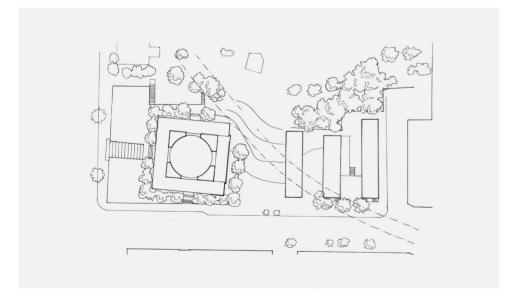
Site Plan with spilling Observatory Hill, Existing, 1:1000.
